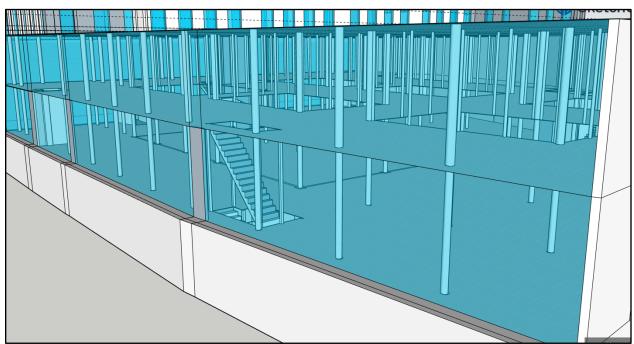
View of the ground and first floor Mulberry Street windows in the whole building model. You can see a customer staircase leading to the basement and first floors at center.
